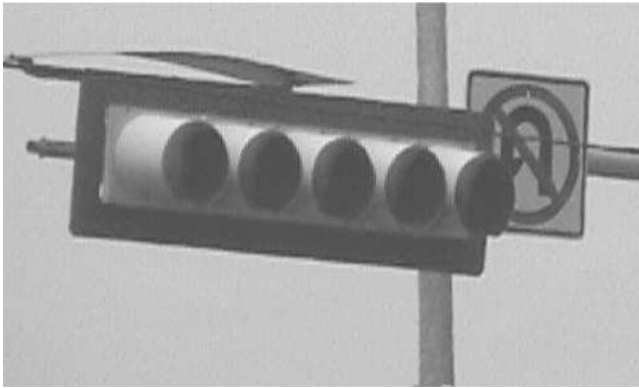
Broken damping plate improperly installed on Dallas signal structure.
